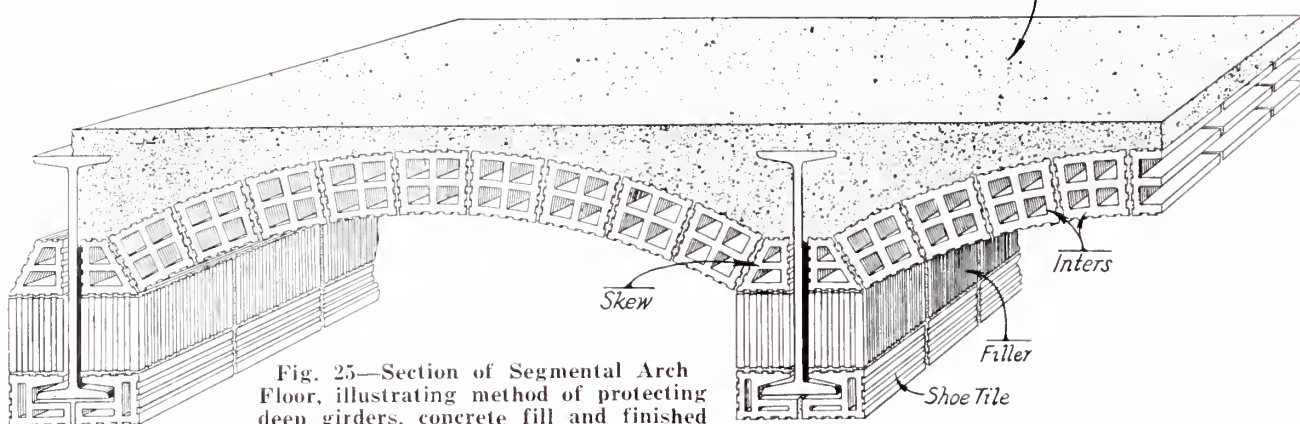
Section of Segmental Arch Floor, illustrating method of protecting deep girders, concrete fill and finished concrete floor.
